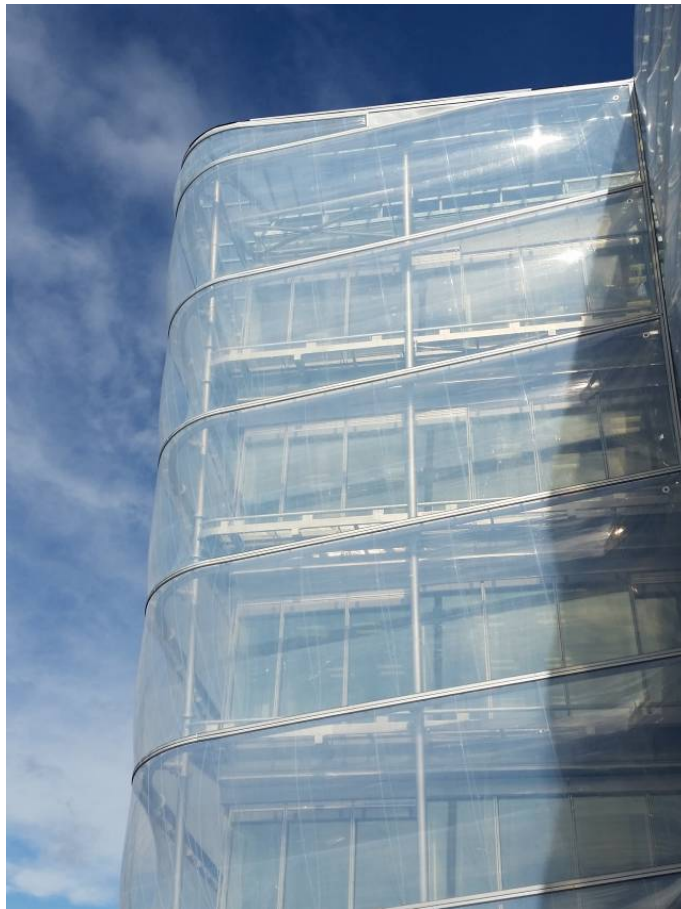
Transparent membrane ETFE with triple glazing in second plane [1].
